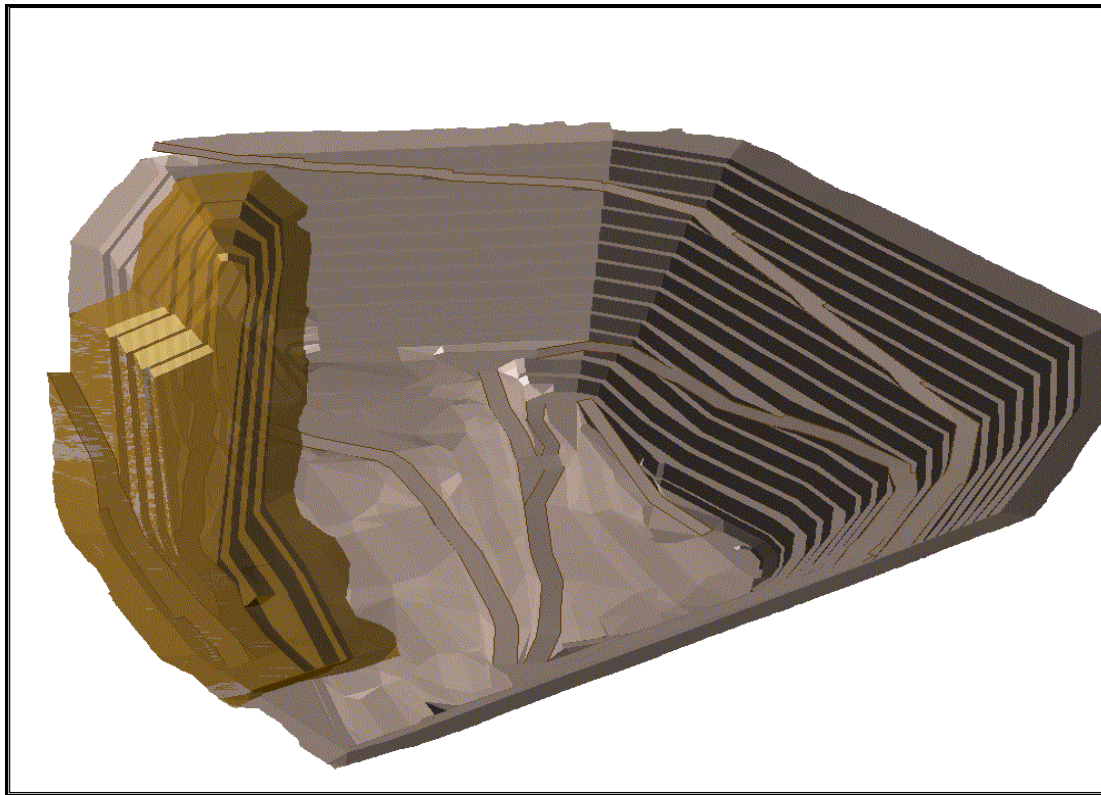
3D-view Looking North, Showing Possible Starter Pit and Final Pit Shapes.
